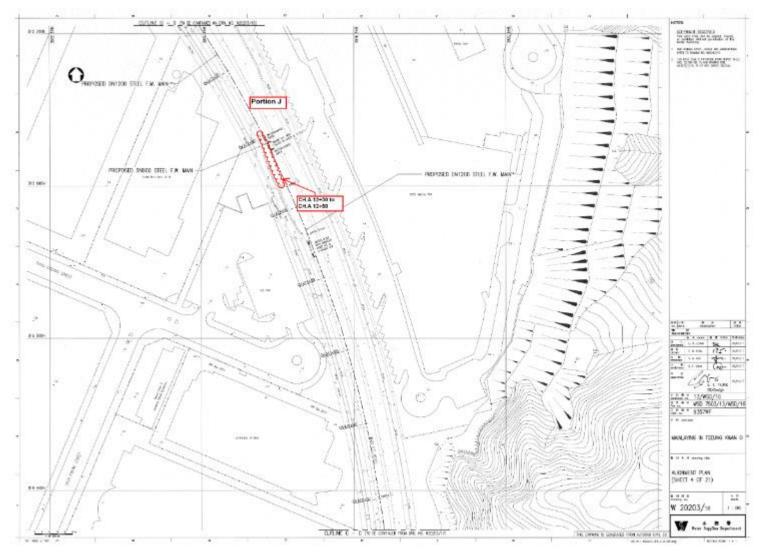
Location Plan for Portion J - CH.A 12+30 to CH.A 12+50
